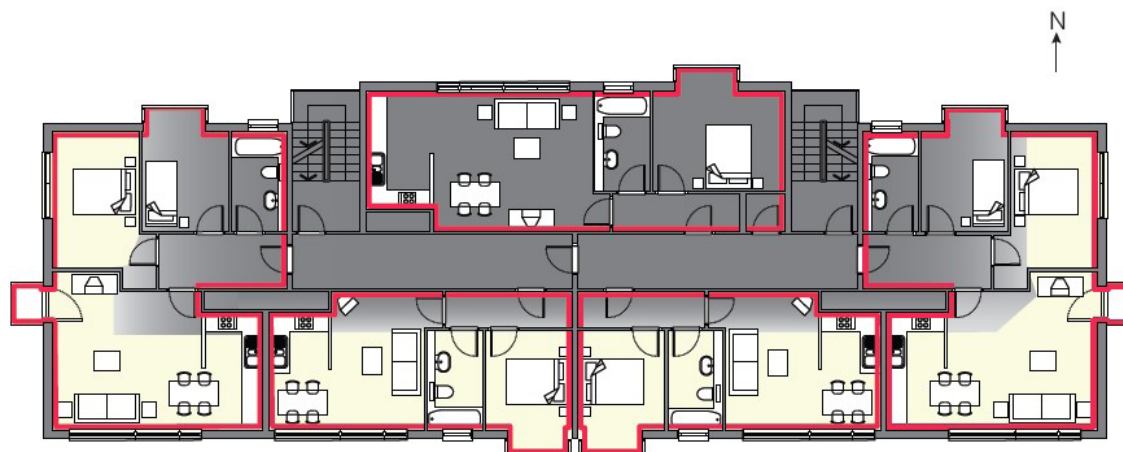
Careful layout design means that four out of the five flats shown have a south-facing living room
